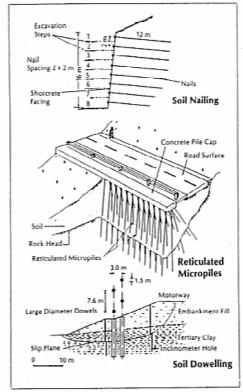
The family of in situ soil reinforcement techniques. (Bruce and Jewell, 1986)
